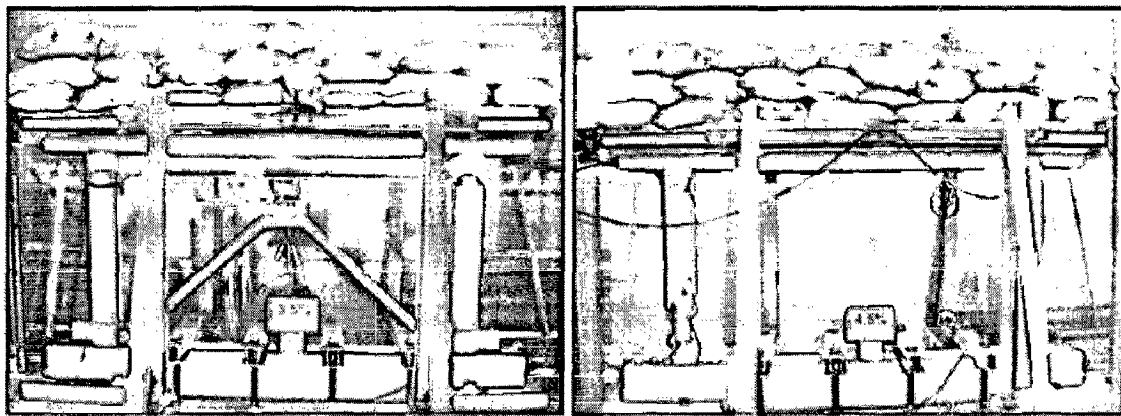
Test arrangement a) Strengthen frame b) RC (bare) frame ^[27]
